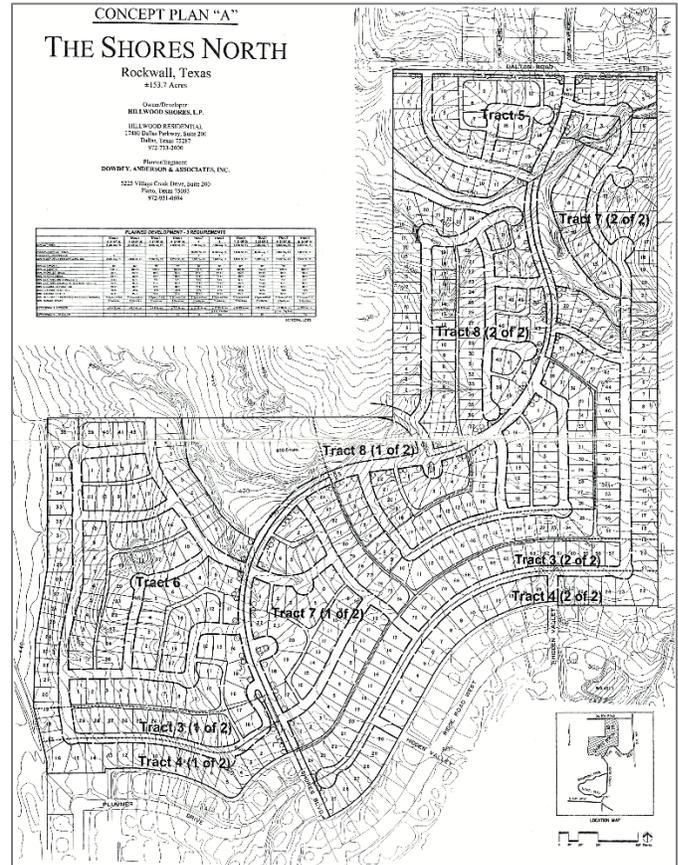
CONCEPT PLAN USED TO SUBDIVIDE AND PERMIT HOUSING IN THIS SUBDIVISION
